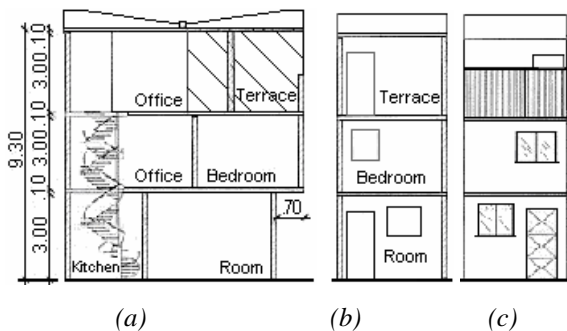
Sections and facade; section AA (a), section BB (b) and facade (c).
